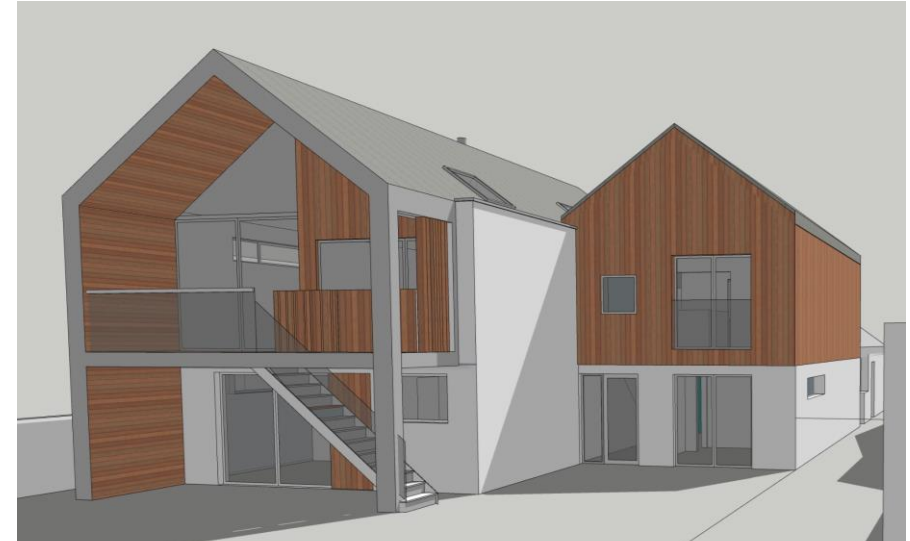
Approved rear view with roof over balcony which is added to the rear of the original house
